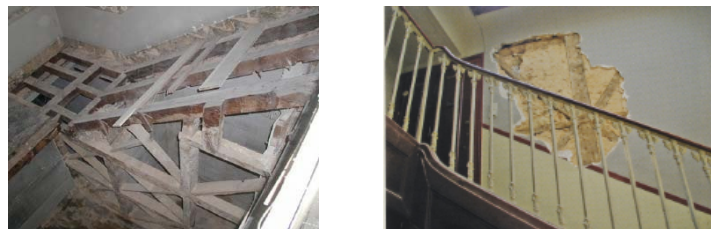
Timber staircase (Appleton, 2008 and Lopes *et al.*, 2008).
